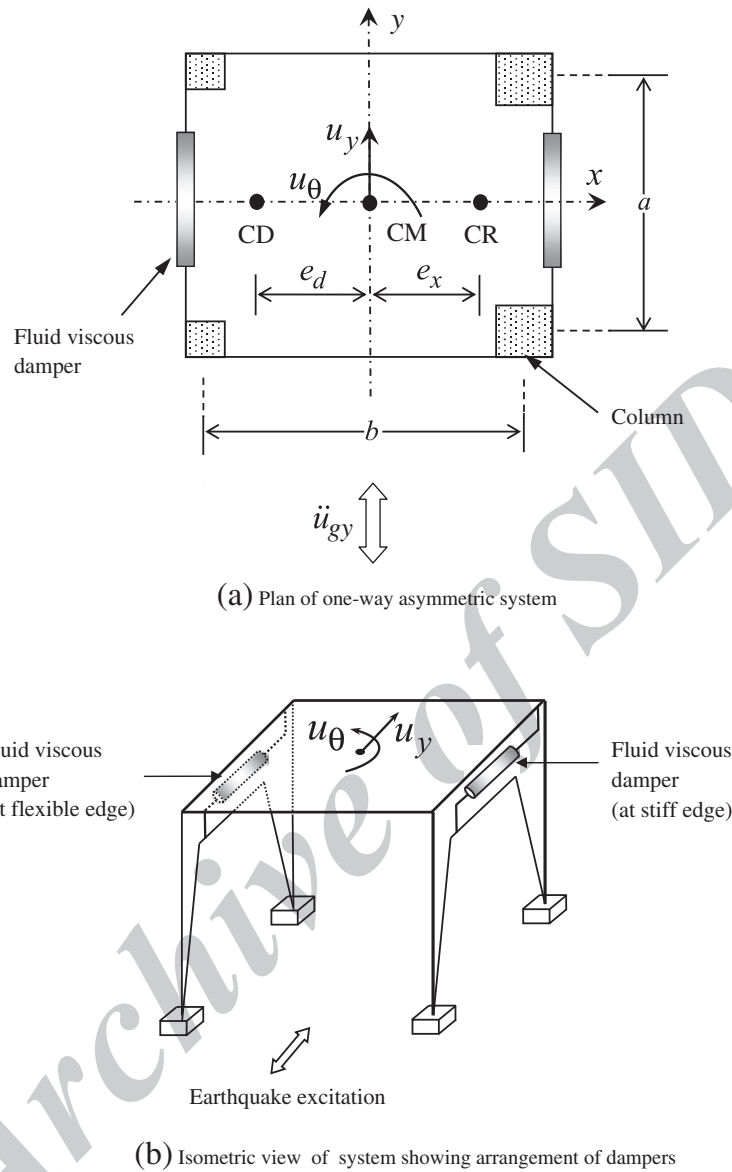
Plan and isometric view of one-way asymmetric system showing arrangement of dampers. (a) Plan of one-way asymmetric system. (b) Isometric view of system showing arrangement of dampers.
